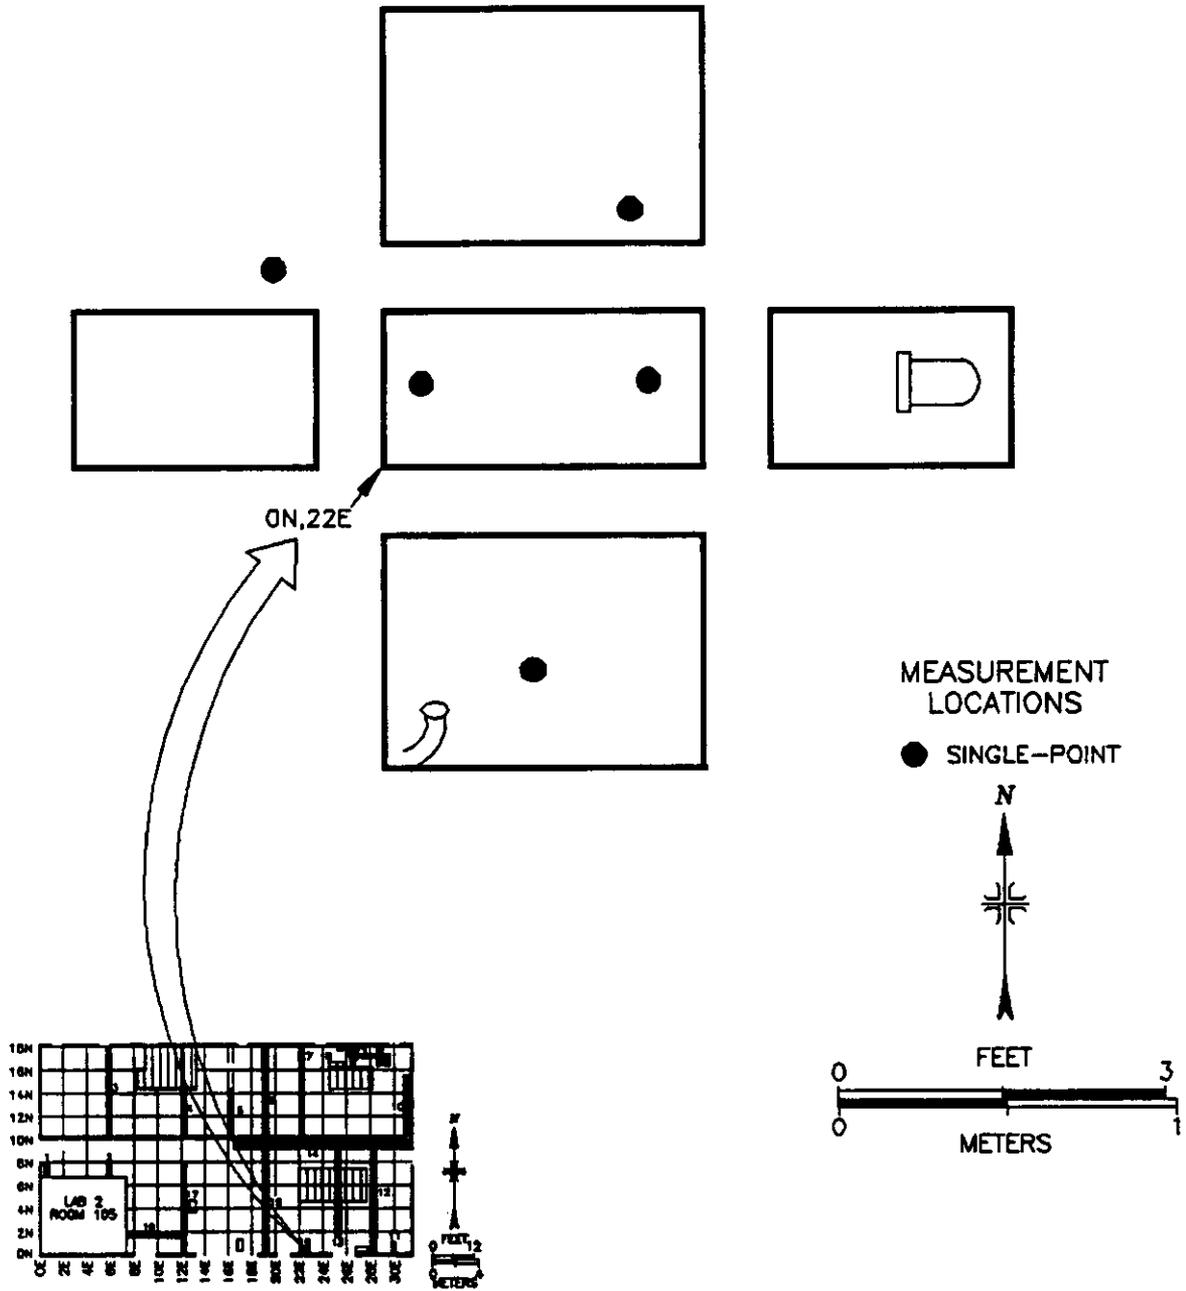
ARC-Building 23, Lab 1, Sump on South Wall Between Rooms 112 and 113 Indicating Measurement Locations
